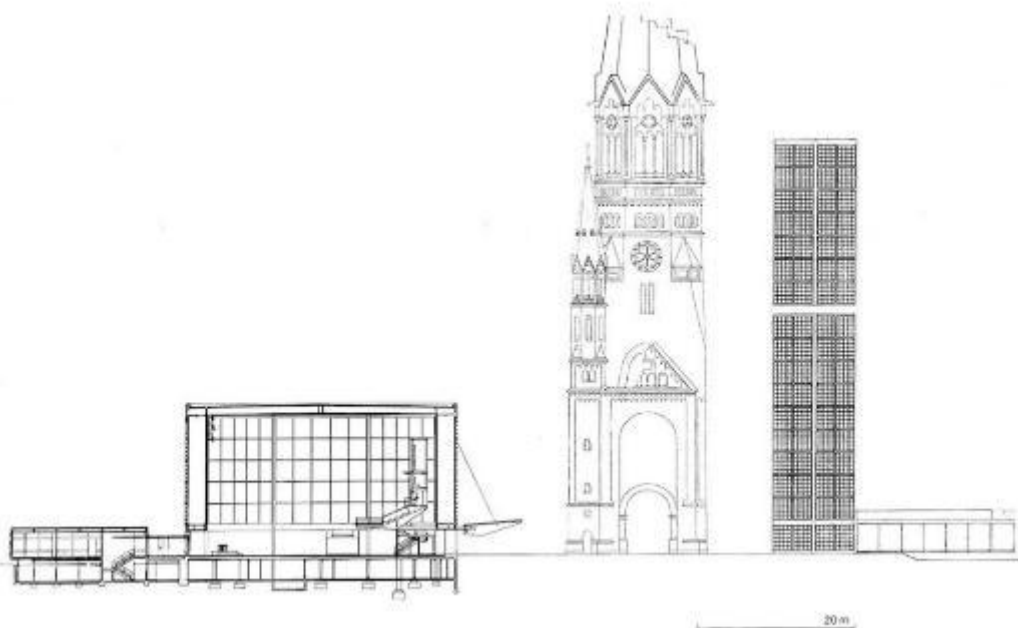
Proposed Elevation of the New Nave and Bell Tower (1963) © Archiweb
